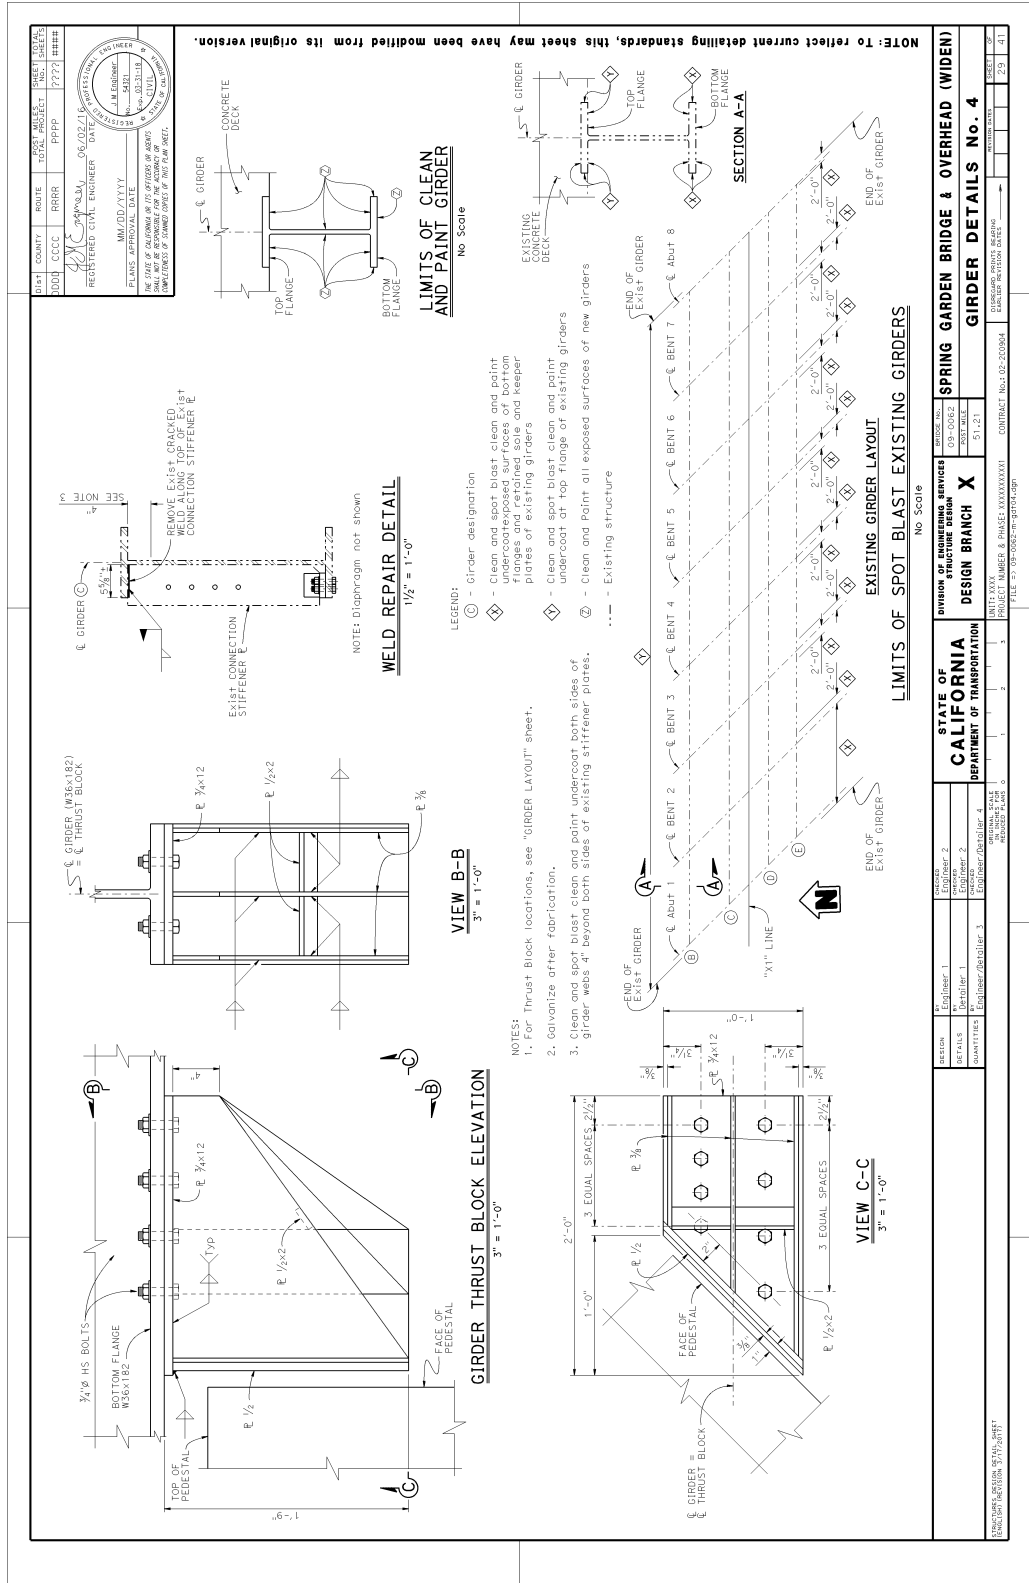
A.A.17 Steel Girder Bridge Detailing Example 17
